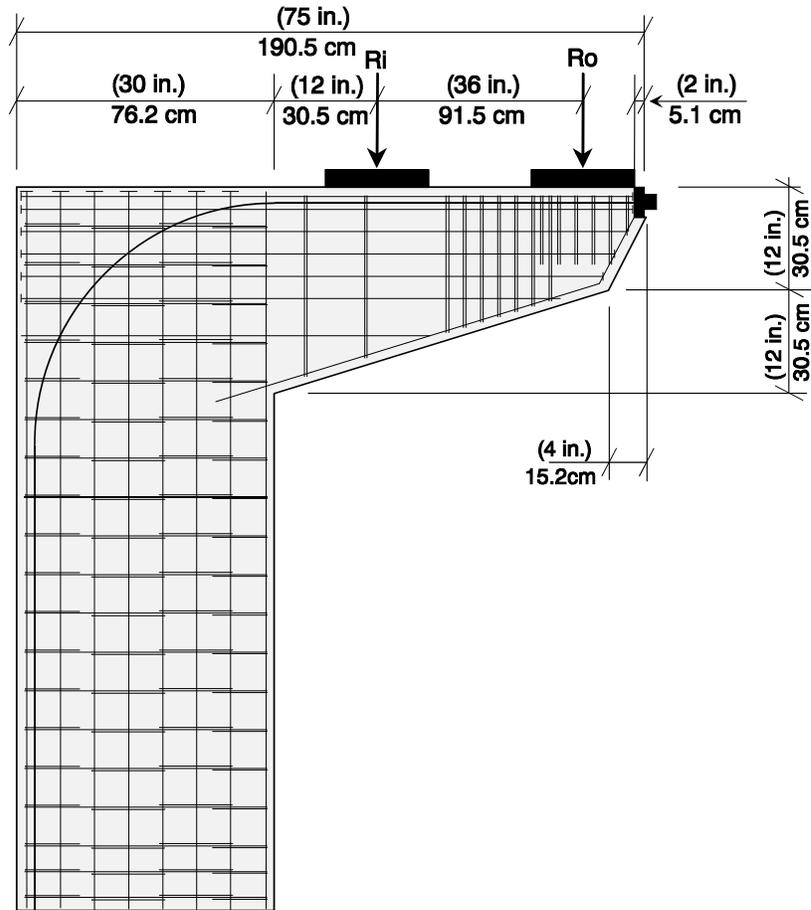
Reinforcing details for Specimen POJ-PU-54-TH
